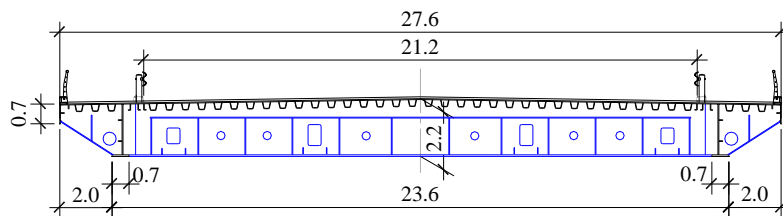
Deck cross-section of the Hongguang Bridge over Liu River
